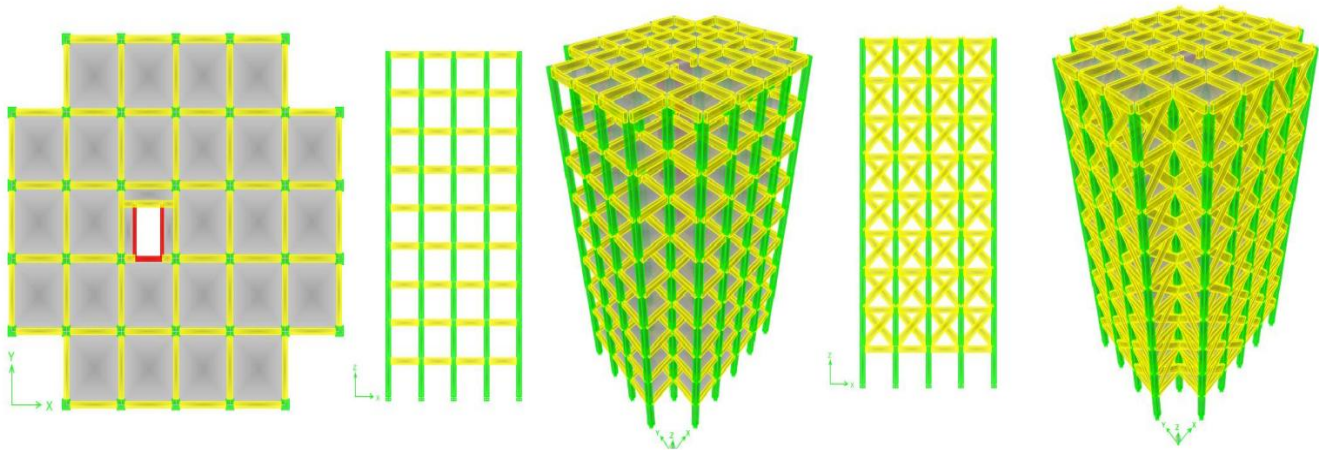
Plan, Elevation and 3D view of bare and infill frame for model-3 and model-4 respectively.
